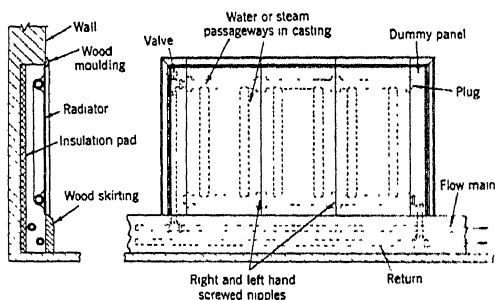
FLAT TYPE PANEL INSTALLED IN WALL RECESS
